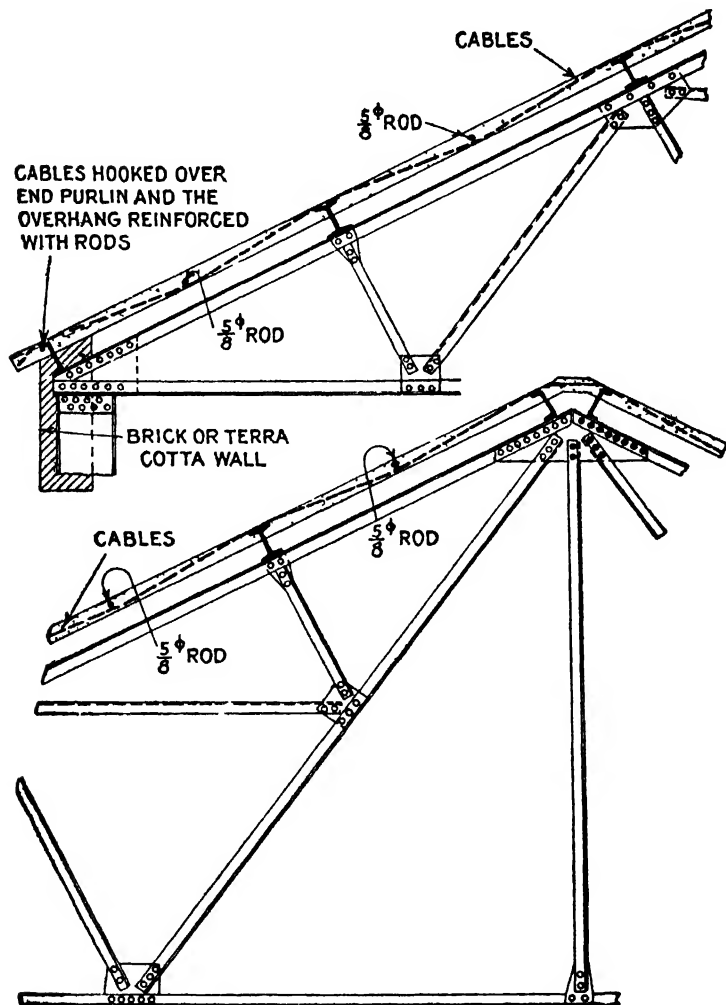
Standard hip truss, fire proof roof construction, lower end.
